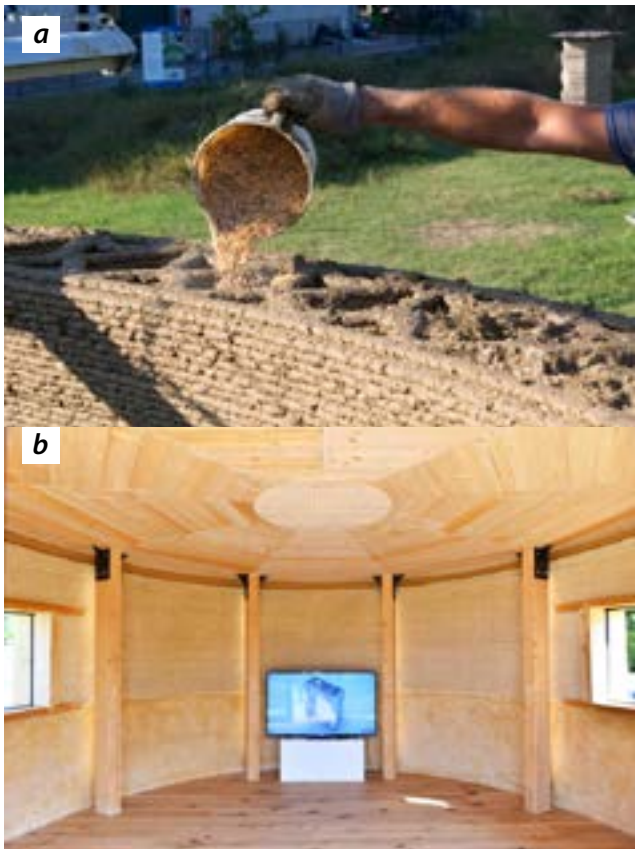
a) Filling the walls with waste; b) Internal cladding.
